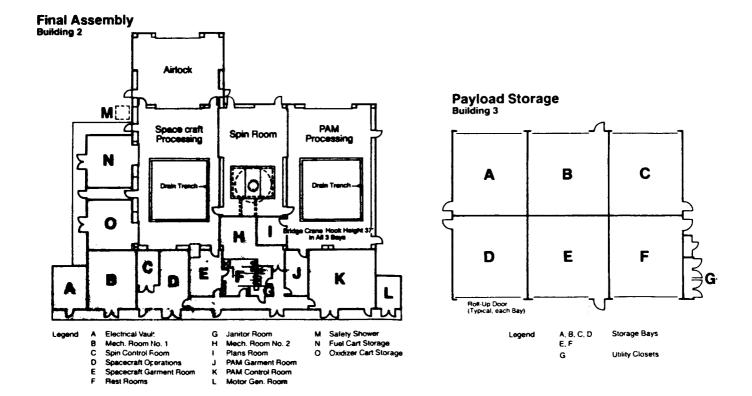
SAEF-2 Floor Plan Figure 7 3)4
